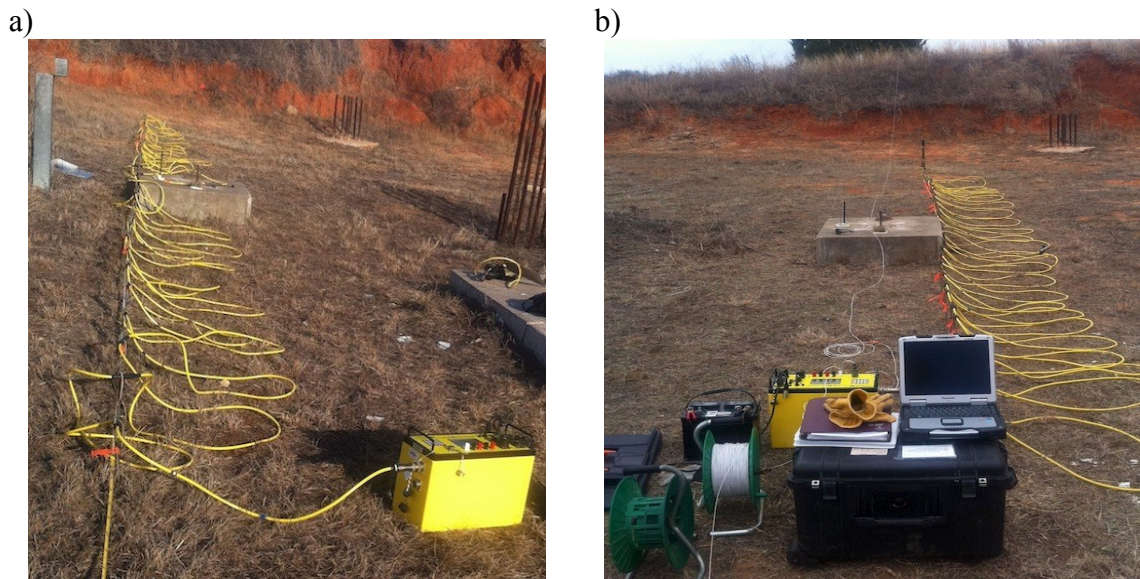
Views over profiles SF1A (a) and SF1B (b) carried out along the two sides of Footing 5.
